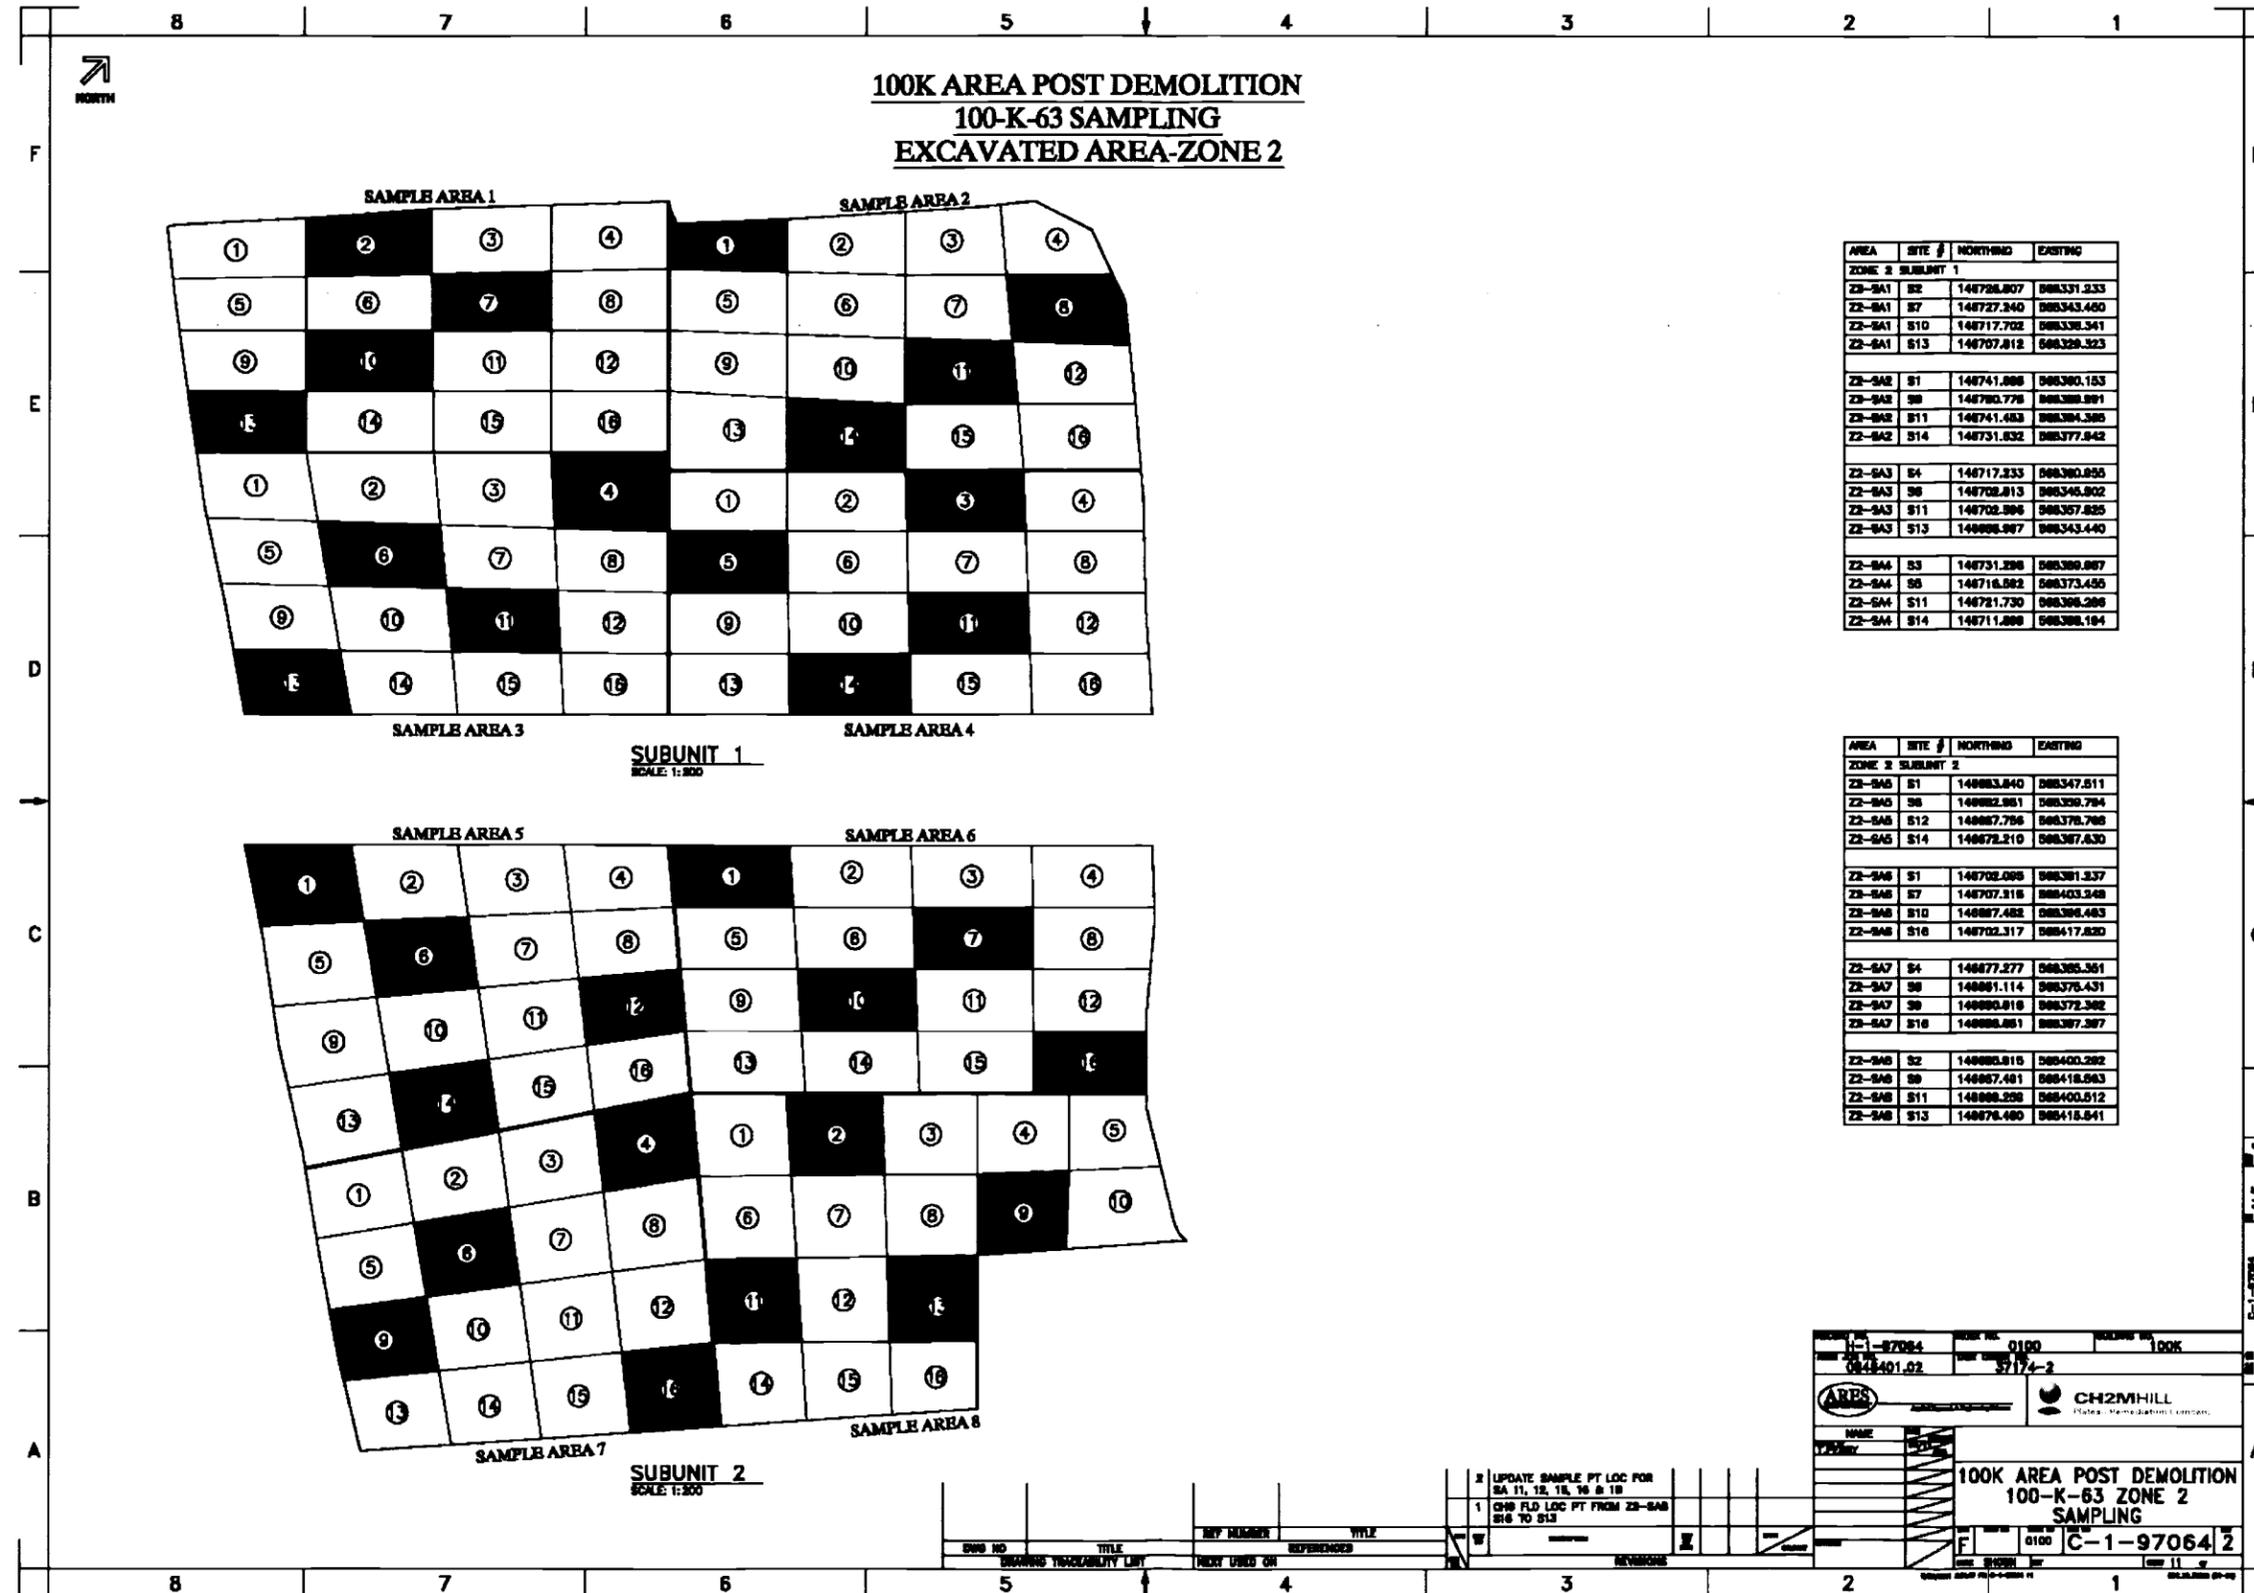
Zone 2 Subunits 1 and 2 Sample Design Layout
